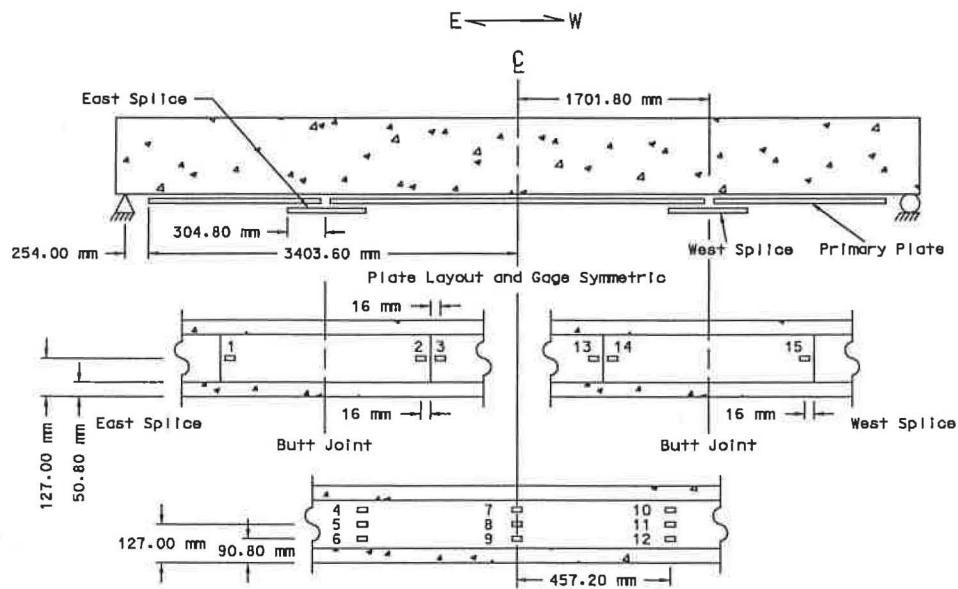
CFRP Plate Layout and Gage Locations, Beam 5 (ULT)
